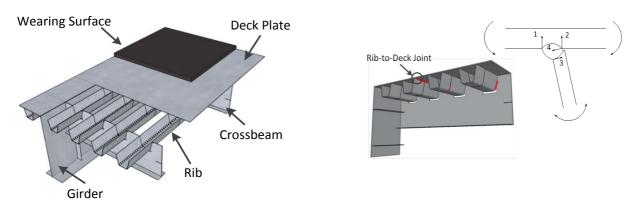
Components of the Orthotropic Steel Deck Bridge and Potential RD Fatigue Crack Types
